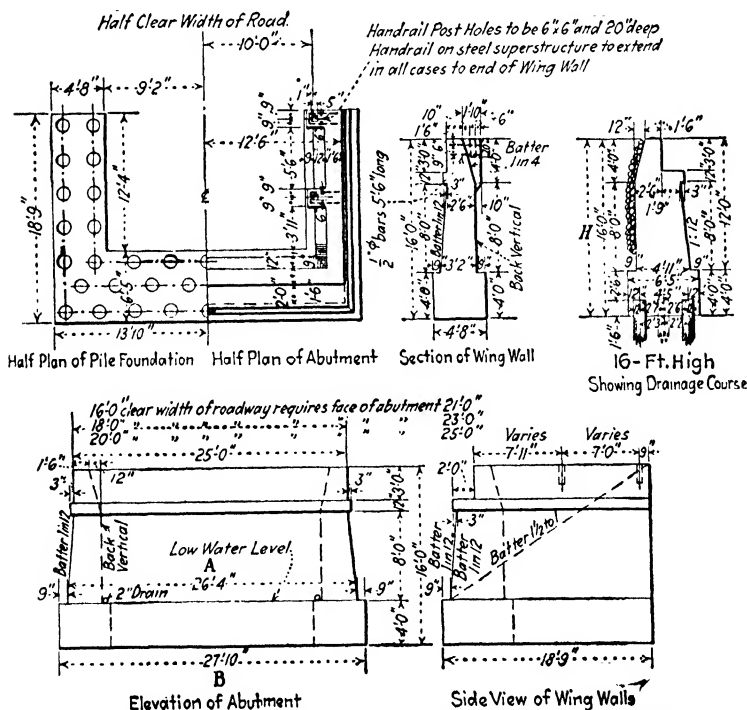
Standard Abutment, Ontario Department of Public Highways.
